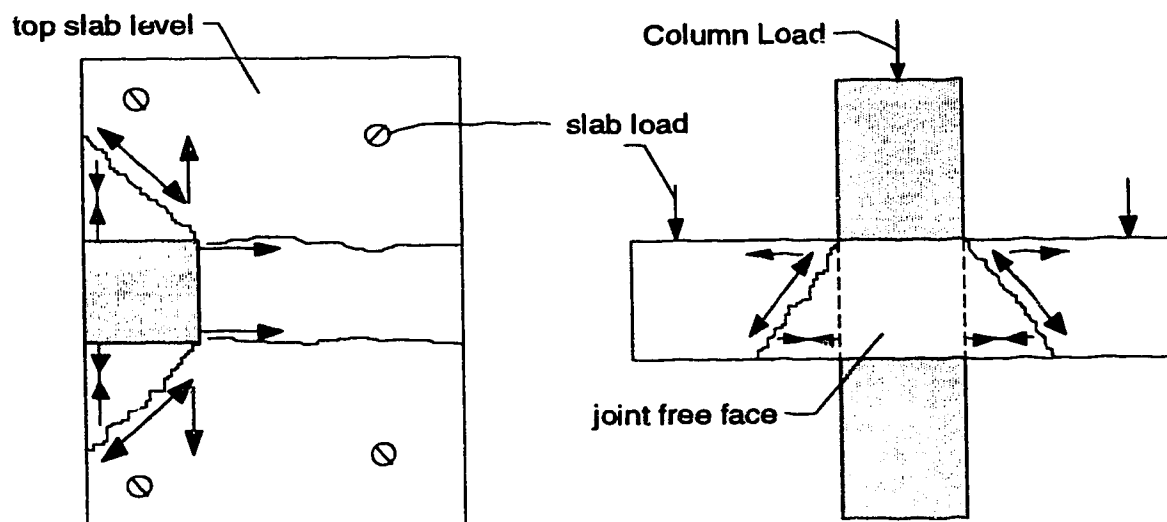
System of forces acting over an edge slab-column joint with slab loads
